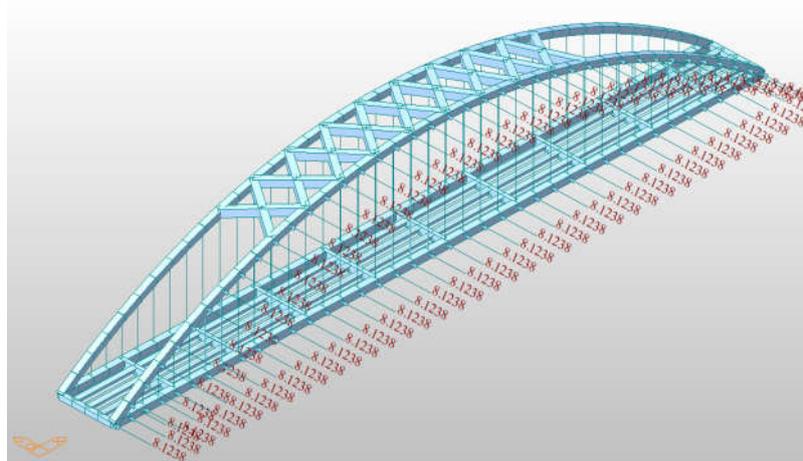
Transverse Wind Load on Single Tied Arch Bridge.
